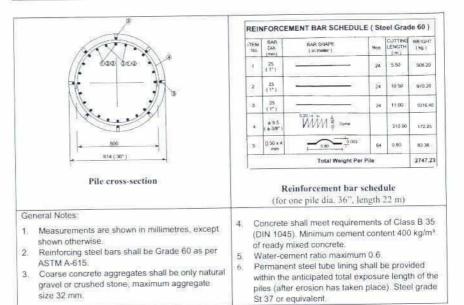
Typical cross-section of bored in-situ cast reinforced concrete pile (here D=914 mm)
